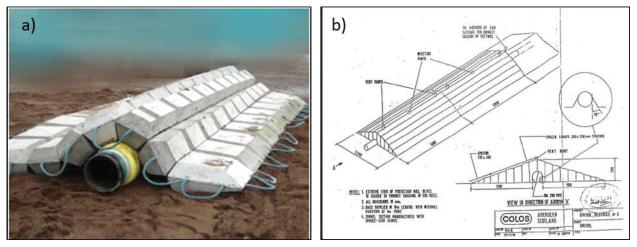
a) Photograph of flexible concrete mattresses and b) drawing of grout filled mattresses.
